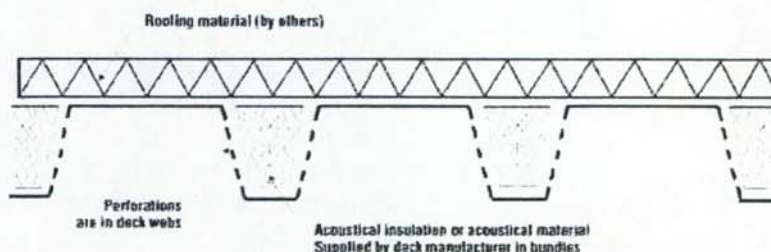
A cross-sectional diagram of the perforated steel acoustic deck used for constructing roofs and ceilings.
